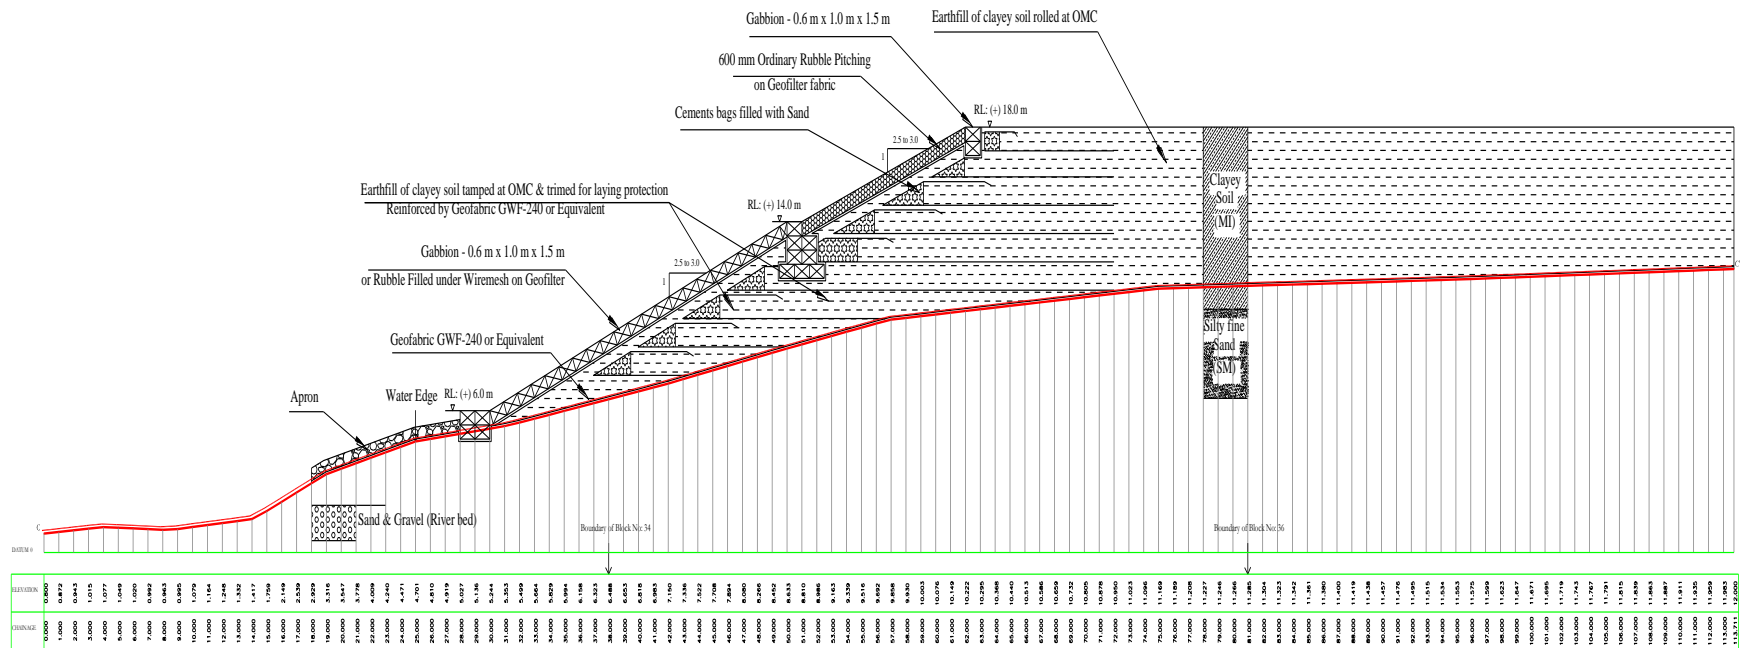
Sketch showing ground treatment at Por Cross Road.
